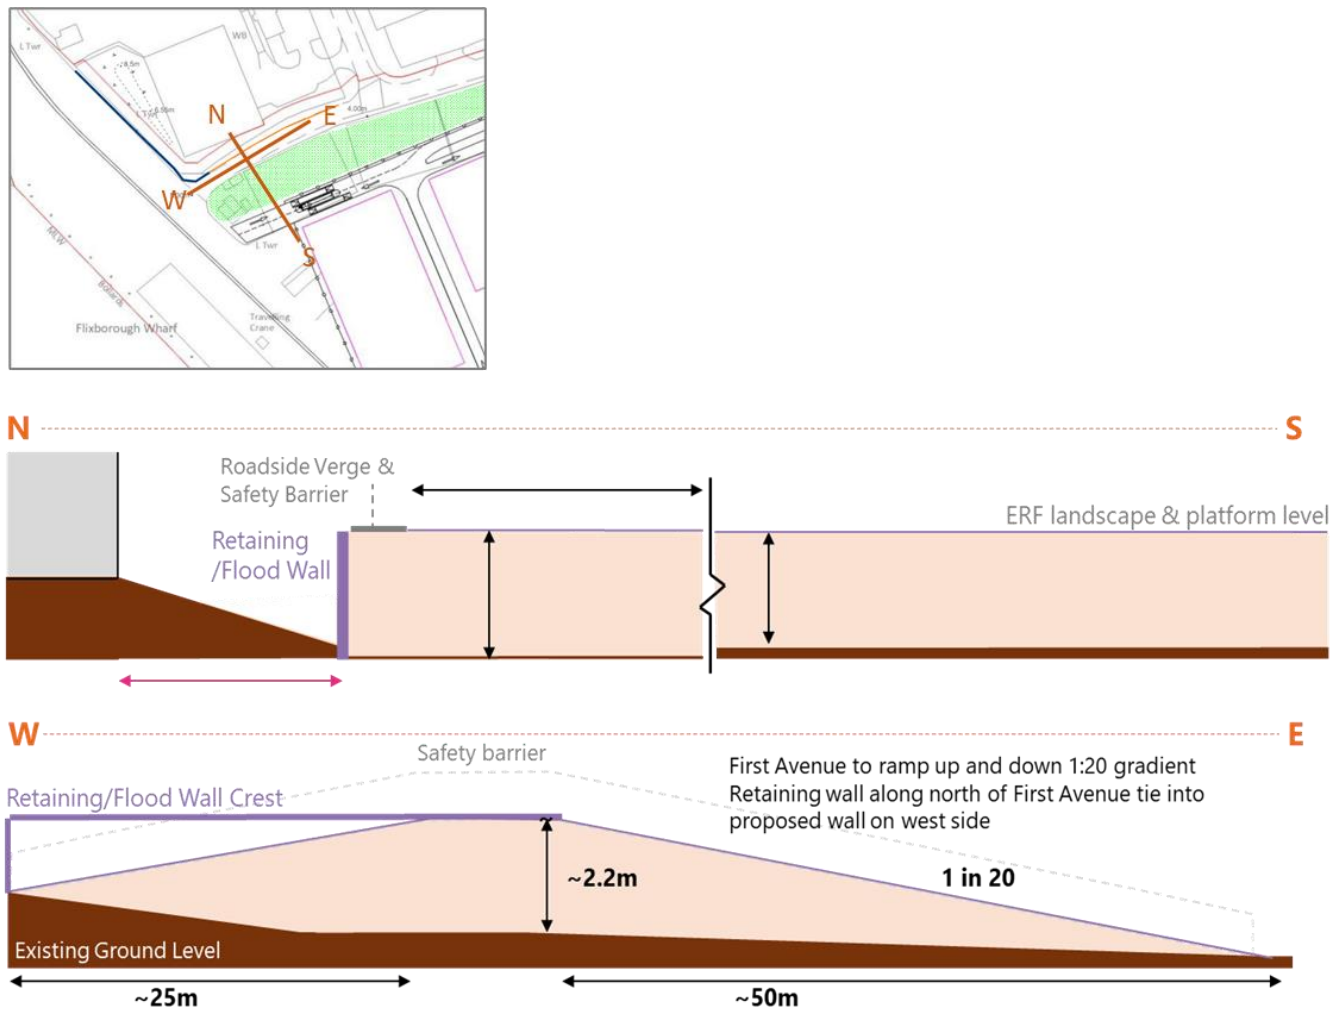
Indicative cross sections along First Avenue illustrating raising of the road for Option 2.
